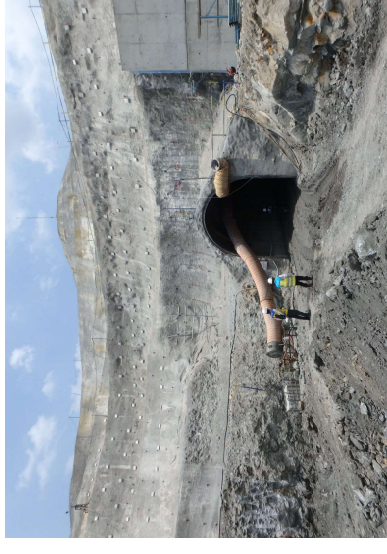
Rock mass conditions near the outlet of the diversion tunnel (1).
